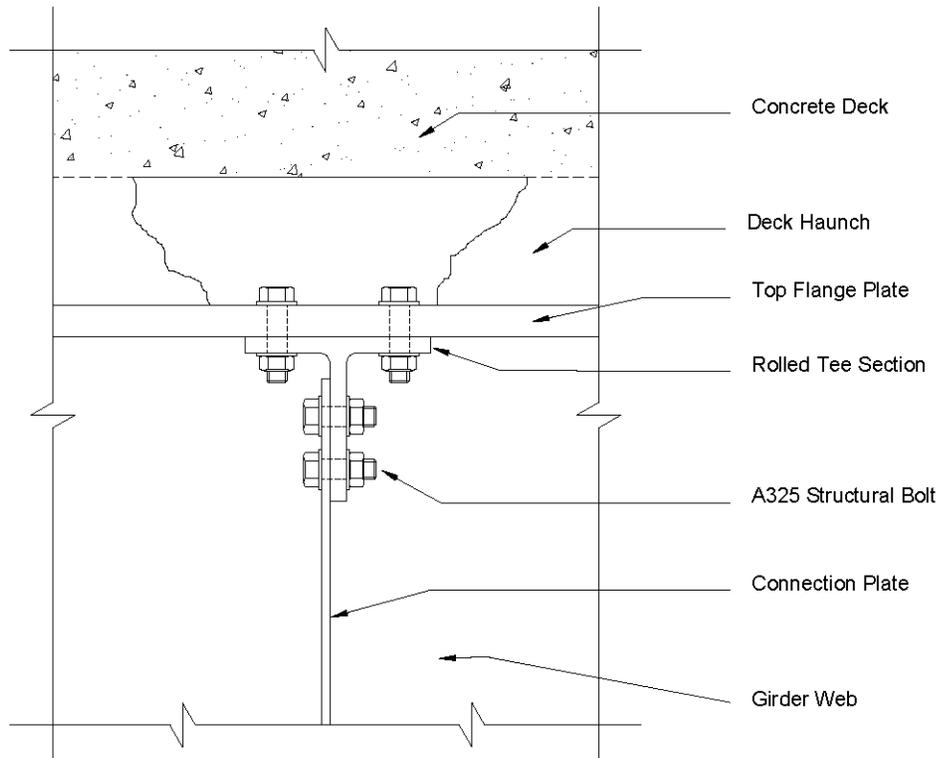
Schematic of concrete deck haunch removal to allow for bolt installation. (Keating 2001)
